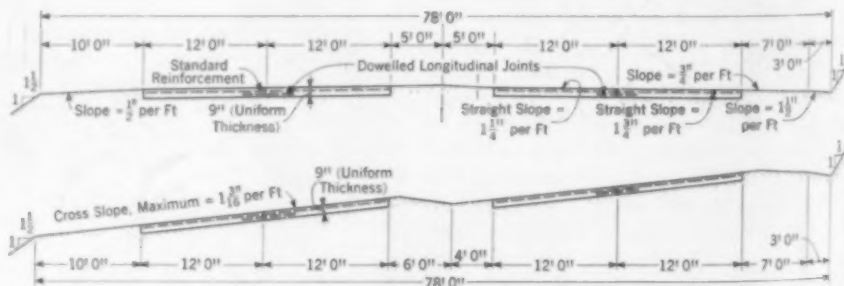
PAVEMENT SECTIONS ON TANGENT (ABOVE) AND SUPER-ELEVATED CURVES (BELOW)
